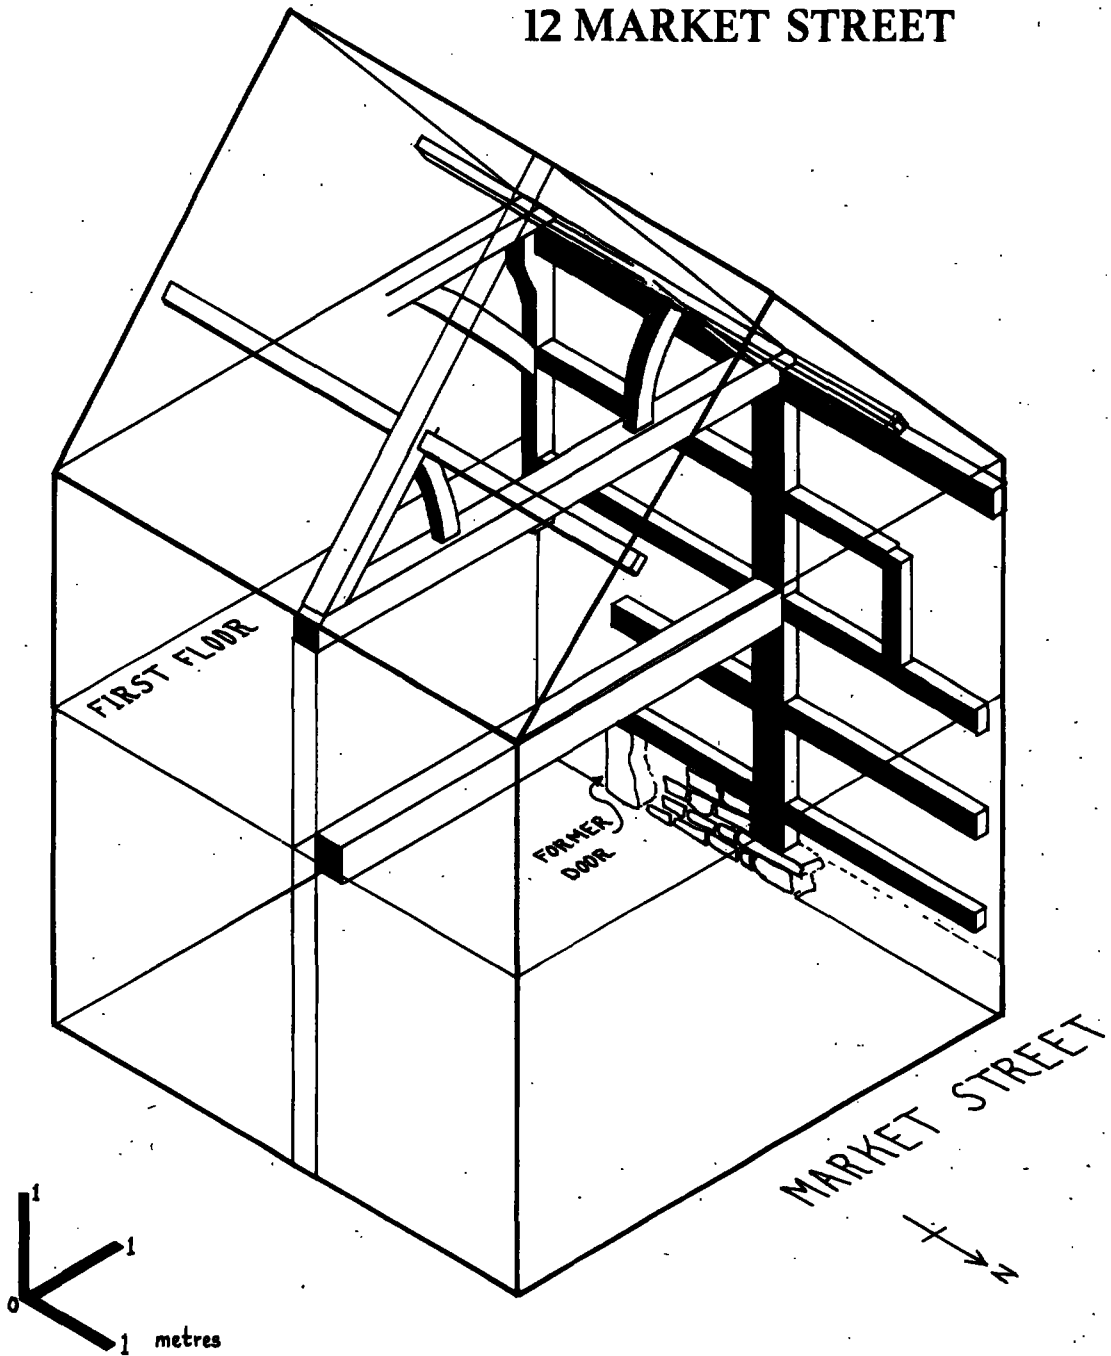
Johnson's Corner: isometric reconstruction of no 12 Market Street. Surviving timbers are shown with one side in solid black. The roof truss is reconstructed from surviving re-used timbers and joints in timbers *in situ*.
